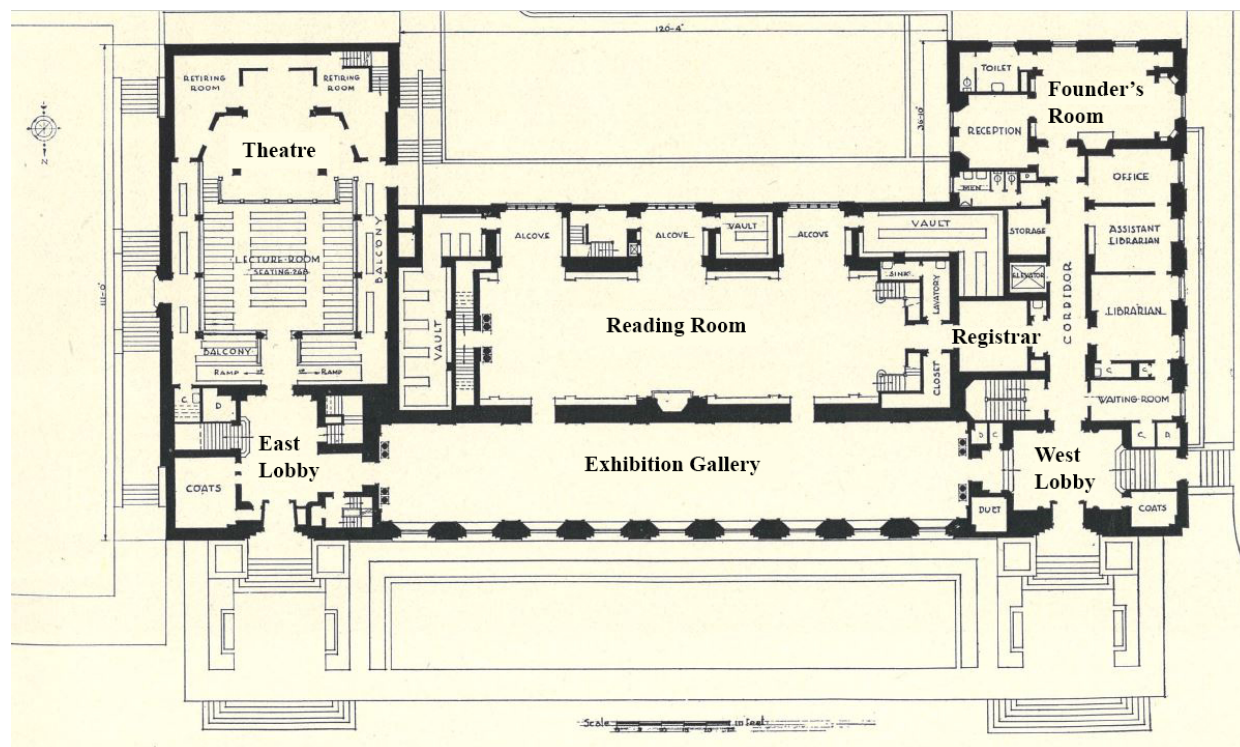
Original Floor Plan (*American Architect*, Vol. 142, No. 2611, September 1932)
